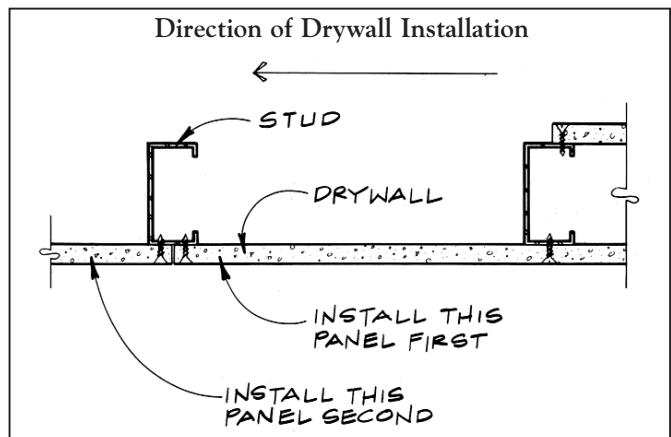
Install studs so the C-sections are properly aligned for drywallers. Then install drywall in the correct direction. Otherwise, drywall will be bumpy.
